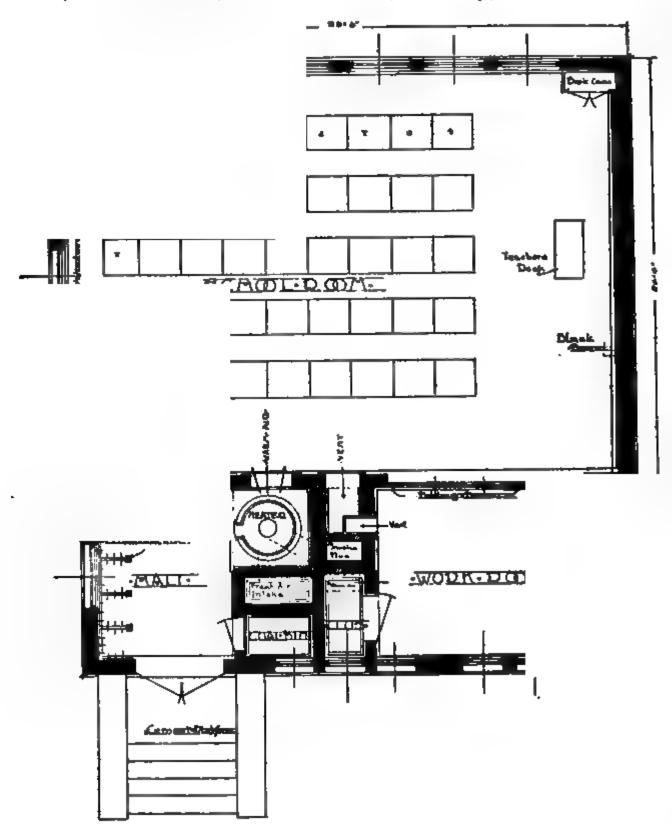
Floor plan of model one-room school, showing seat room. J. H. Felt & Co., Kansas City, Mo., architects.
